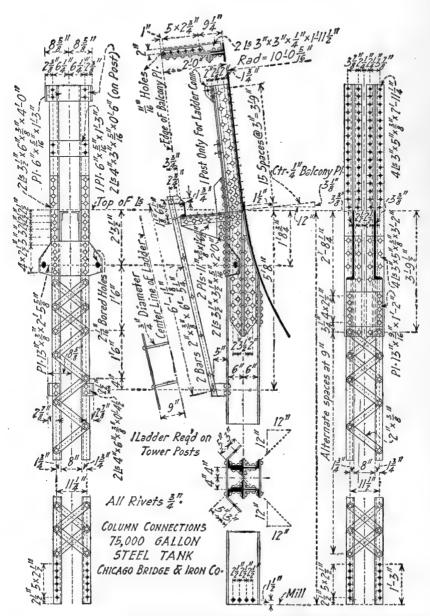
Details of Column Connections for Elevated Tank and Tower. Chicago Bridge & Iron Co.
